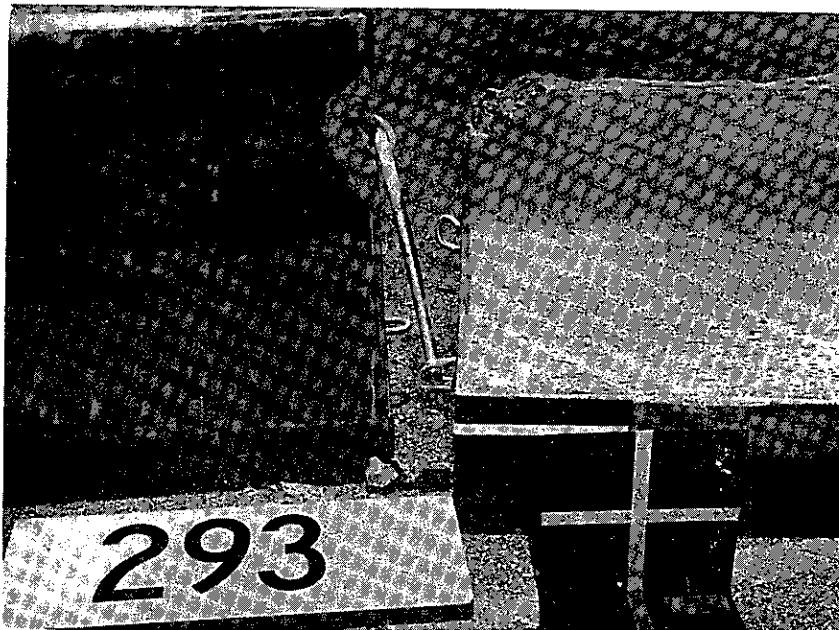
, Bent Steel Rod at Joint 1 (second joint upstream from impact), Test 293
